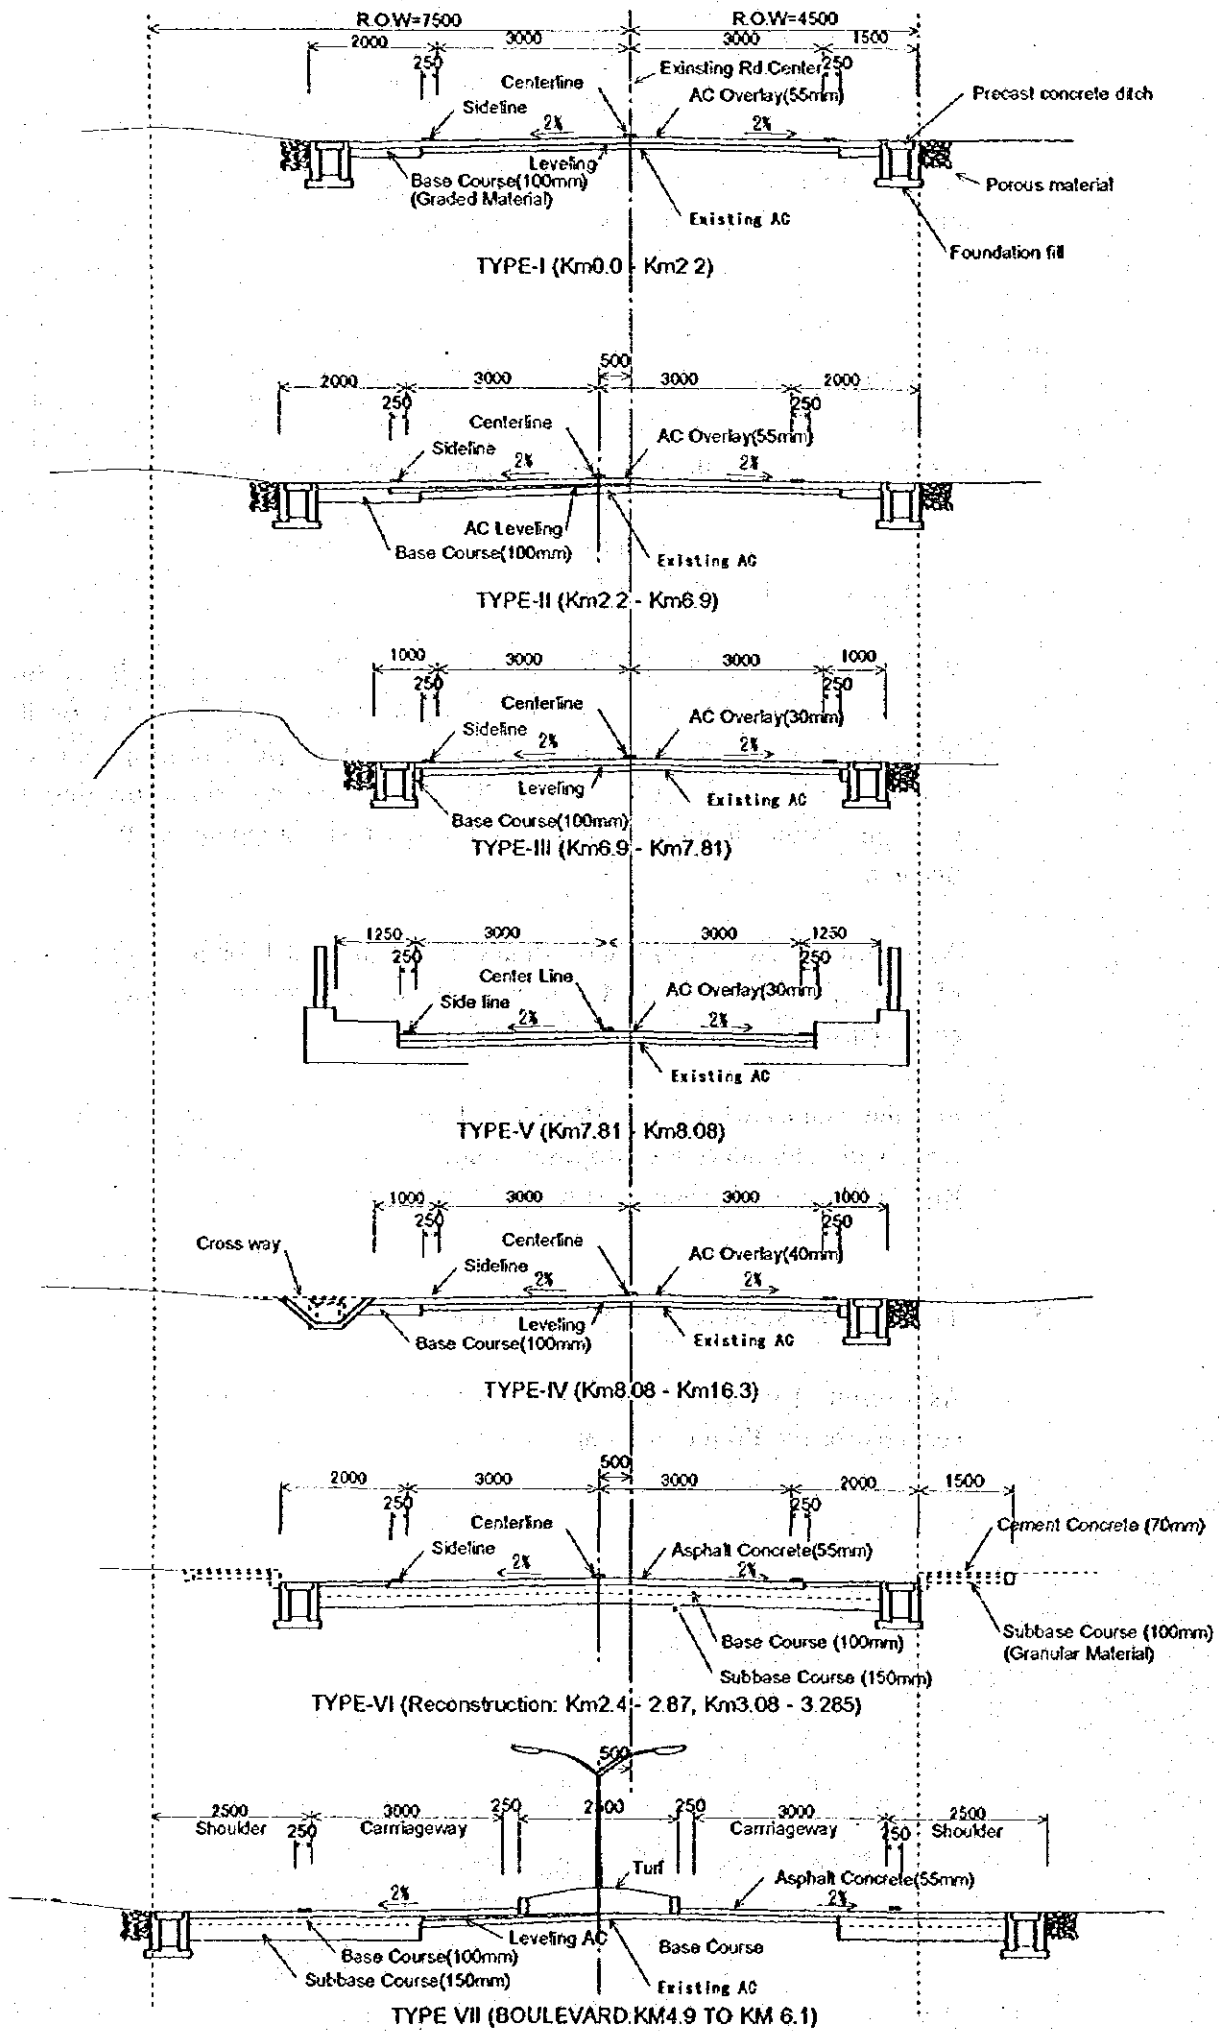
11 TYPICAL CROSS SECTIONS
